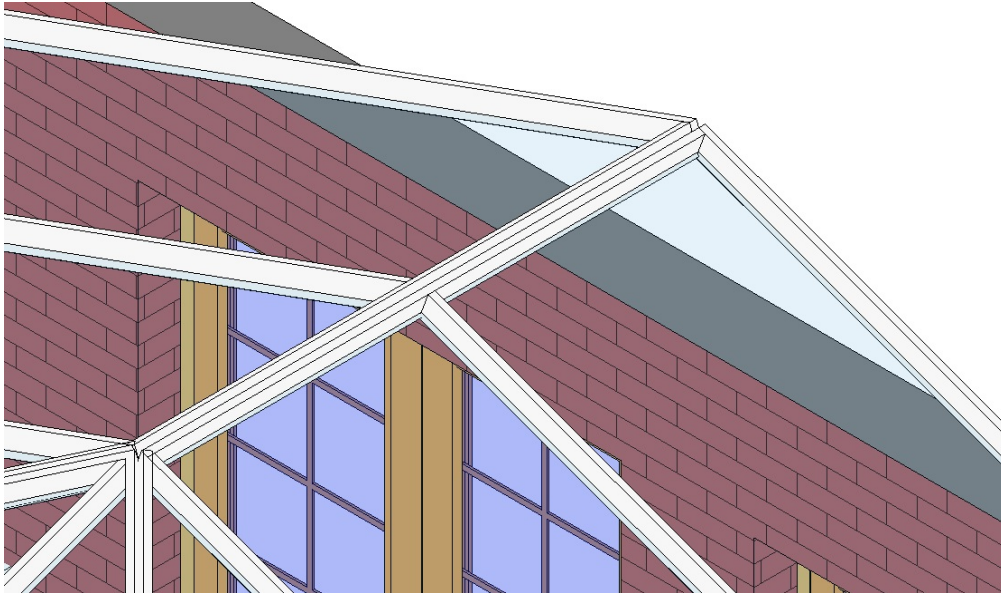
below shows a typical glazed roof construction for an external conservatory.
